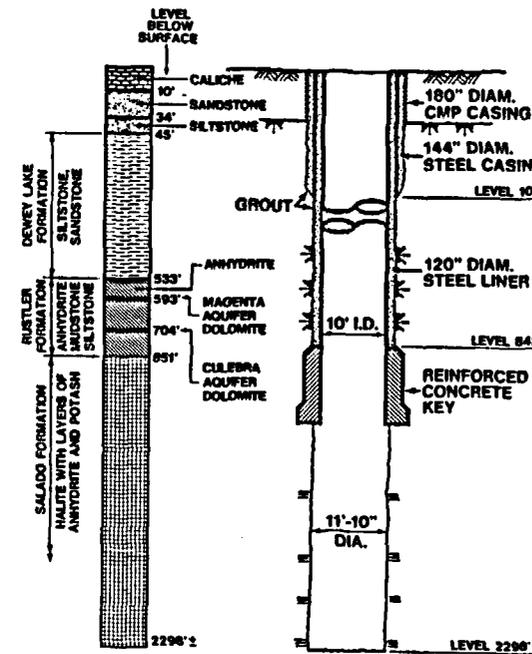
GENERALIZED GEOLOGIC COLUMN AND SHAFT CONSTRUCTION
